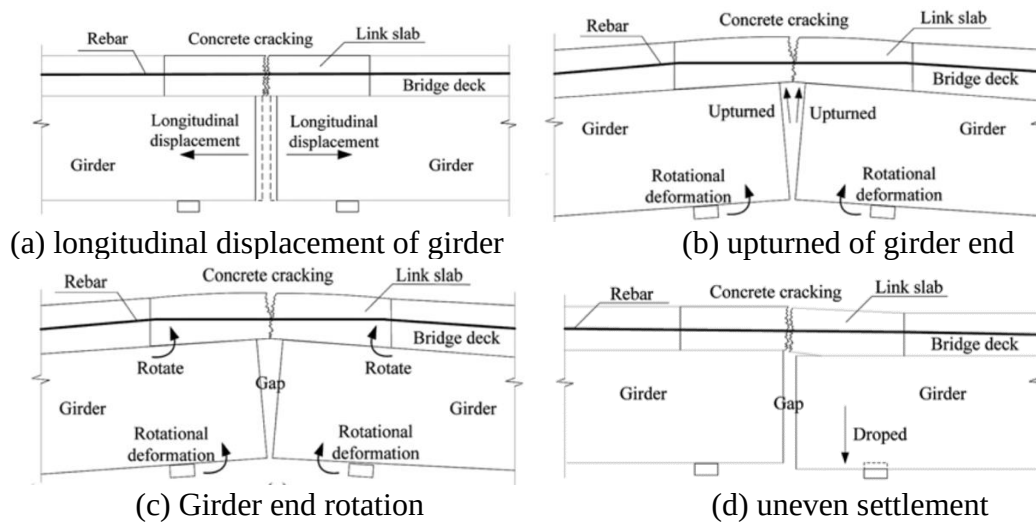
Typical failure type of link slabs (Wang et al. 2019)
